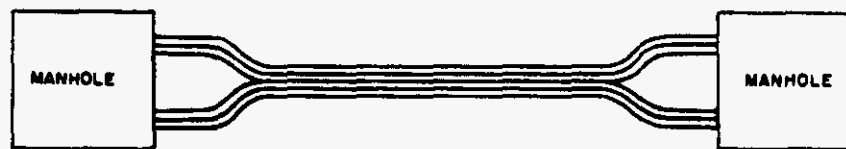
Conduit Formation of Four Vertical Rows or Duct Requirements Are Greater Than Racking Capacity of One Side of Manhole.
